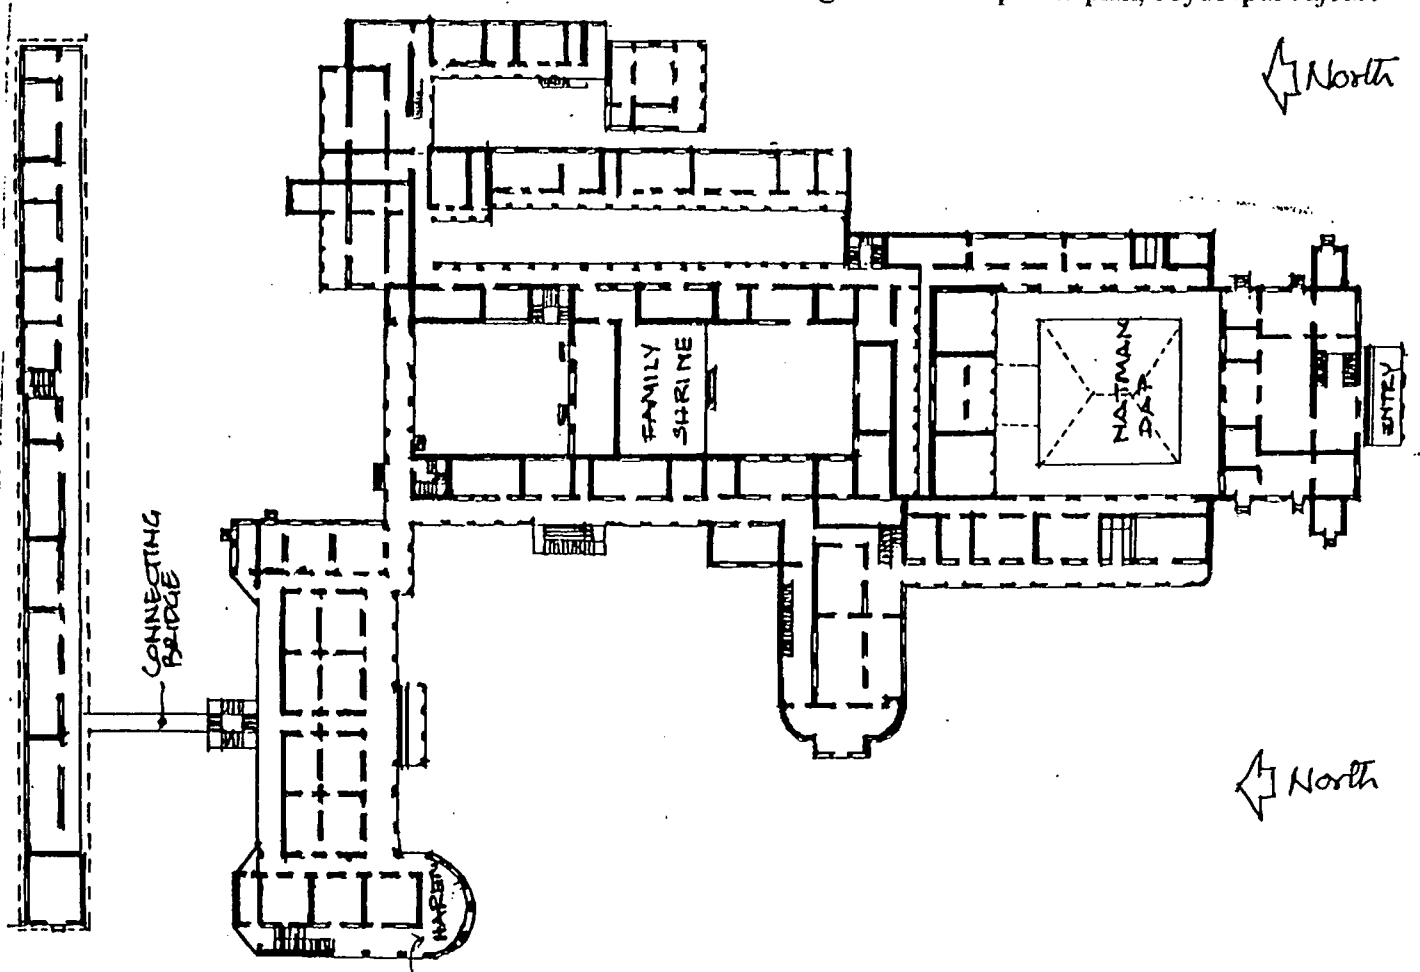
Ground floor plan, Joydevpur rajbari
